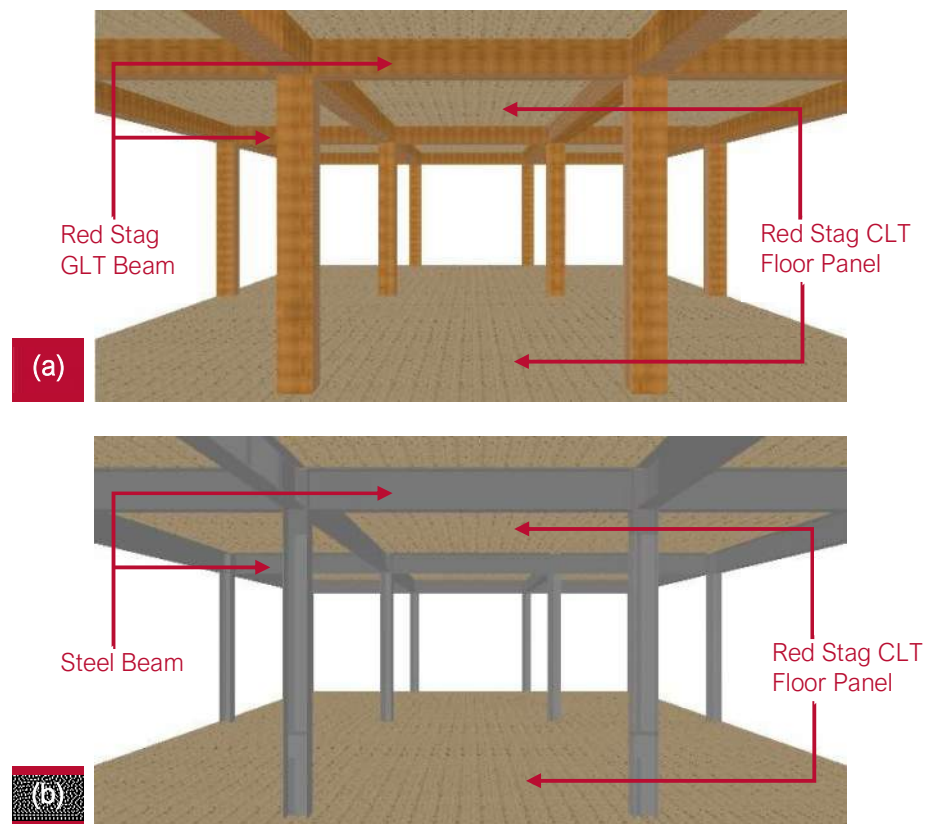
Red Stag CLT floor panel applications in timber or composite structures; (a) Timber system structure; (b) Steel-timber composite structure.
